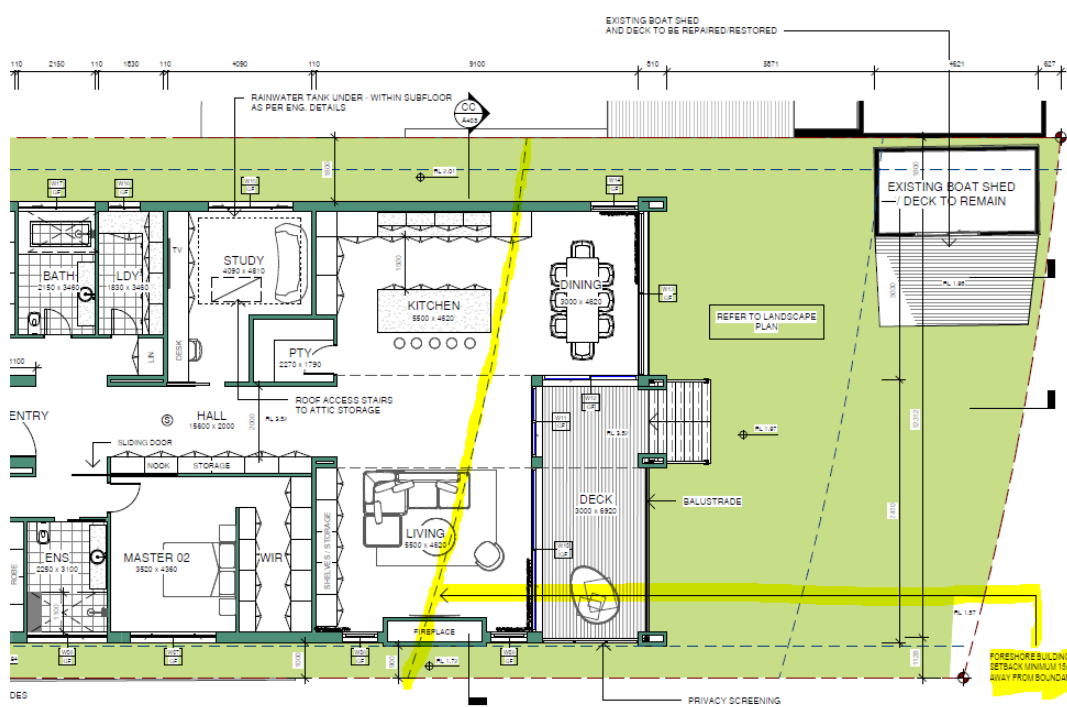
Plan extract showing extent of foreshore building line breach at ground floor level
